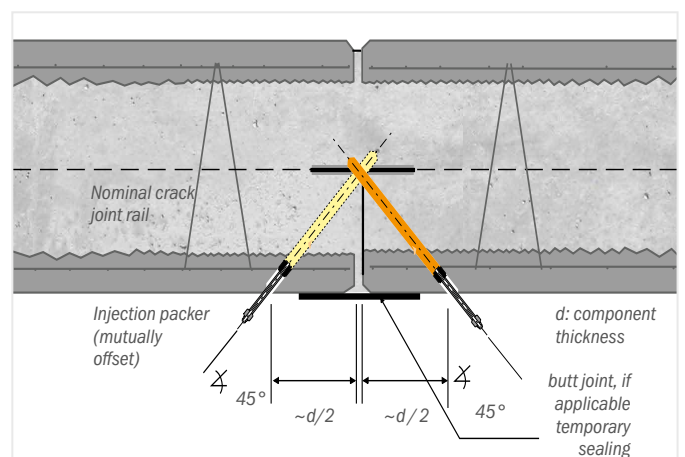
Subsequent sealing of the butt joint of an element wall by injection [7]
